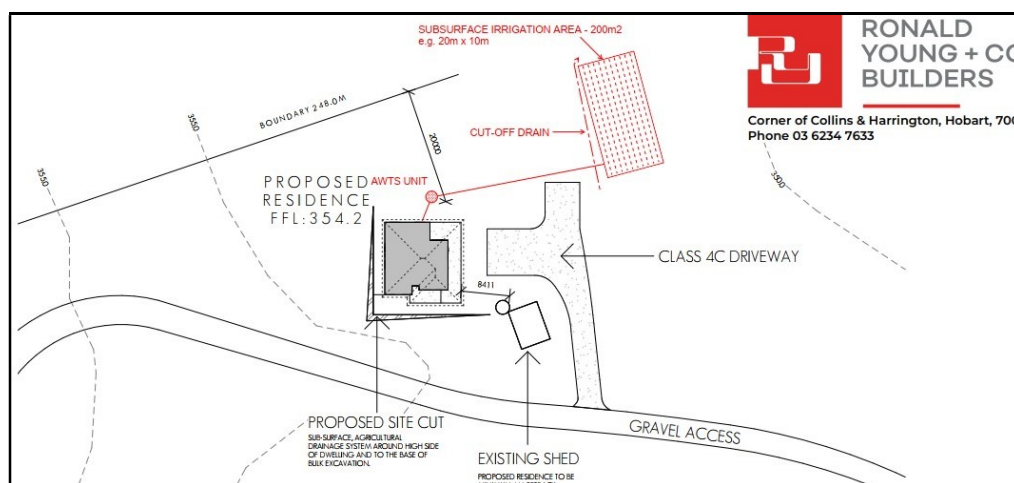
Site plan showing location of the wastewater system and infrastructure clear of vegetation. Note: The final access configuration will be as illustrated in Figure 13.
